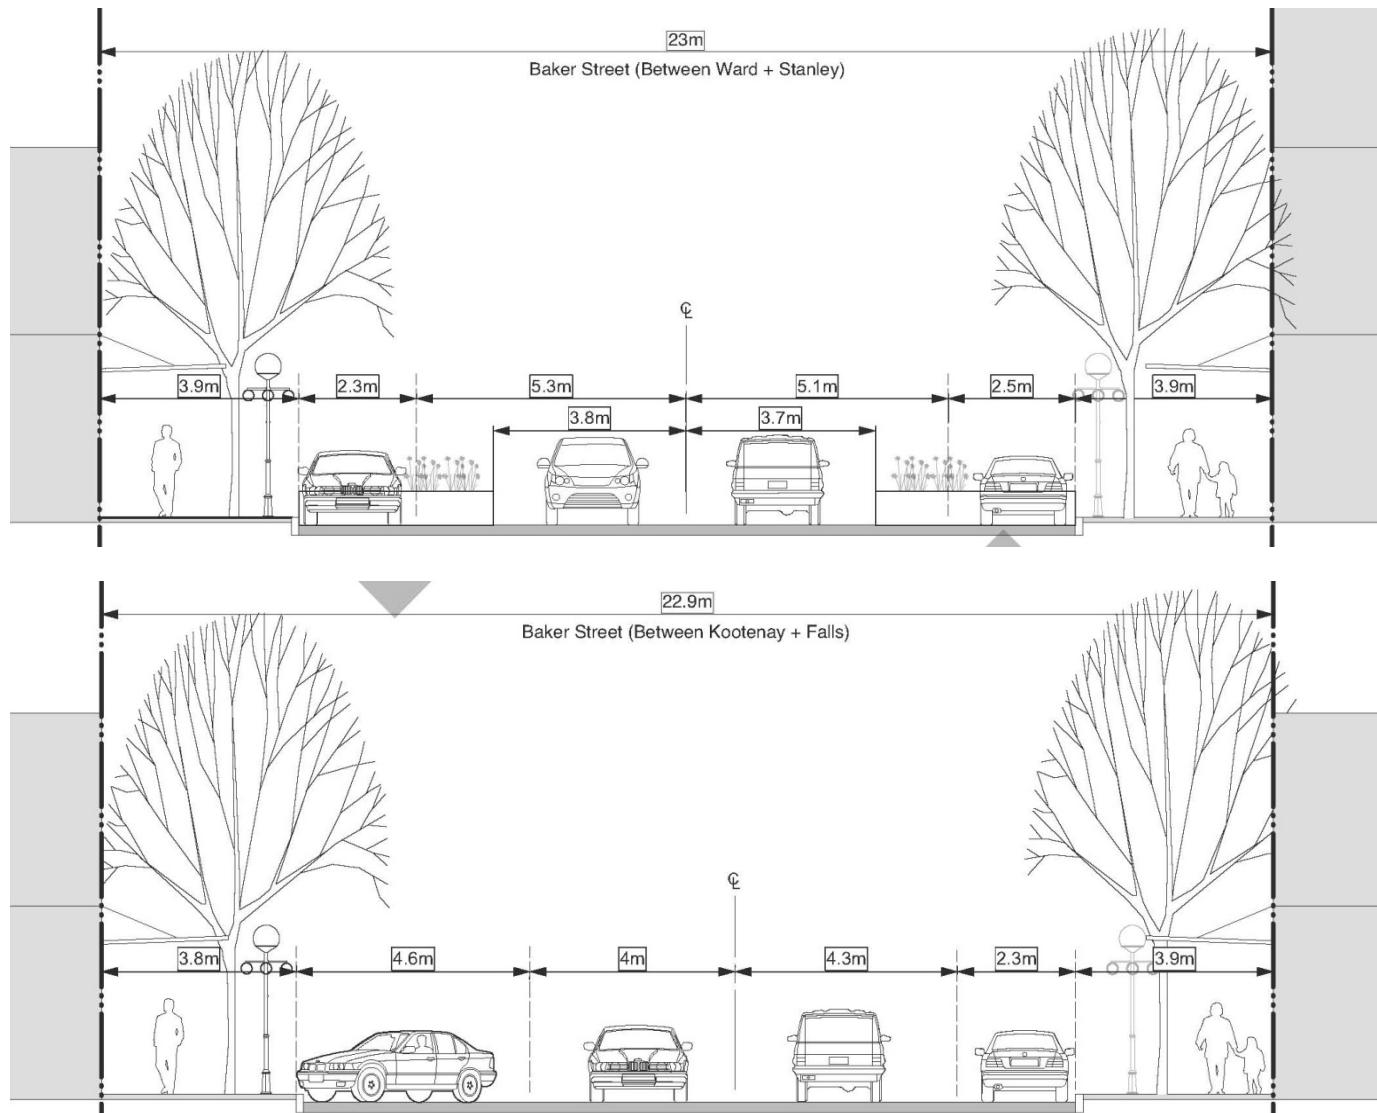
Existing sections through Baker Street illustrate existing sidewalk, parking and travel lane widths that have functional limitations for either expansion or reduction. The minimum travel lane standard width is 4.0 metres. The upper section includes less than the standard 4.0 metres at the public amenity areas, allowing for larger areas that support a pedestrian focus in the downtown.
